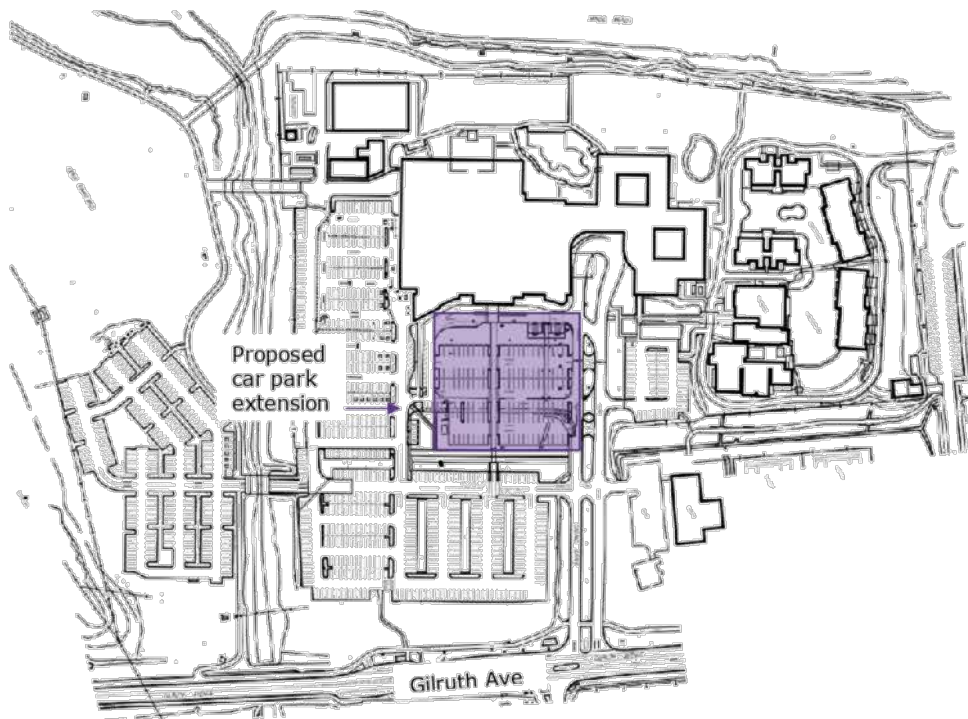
Mindil Beach Casino Site with Proposed Parking Addition (Purple)
